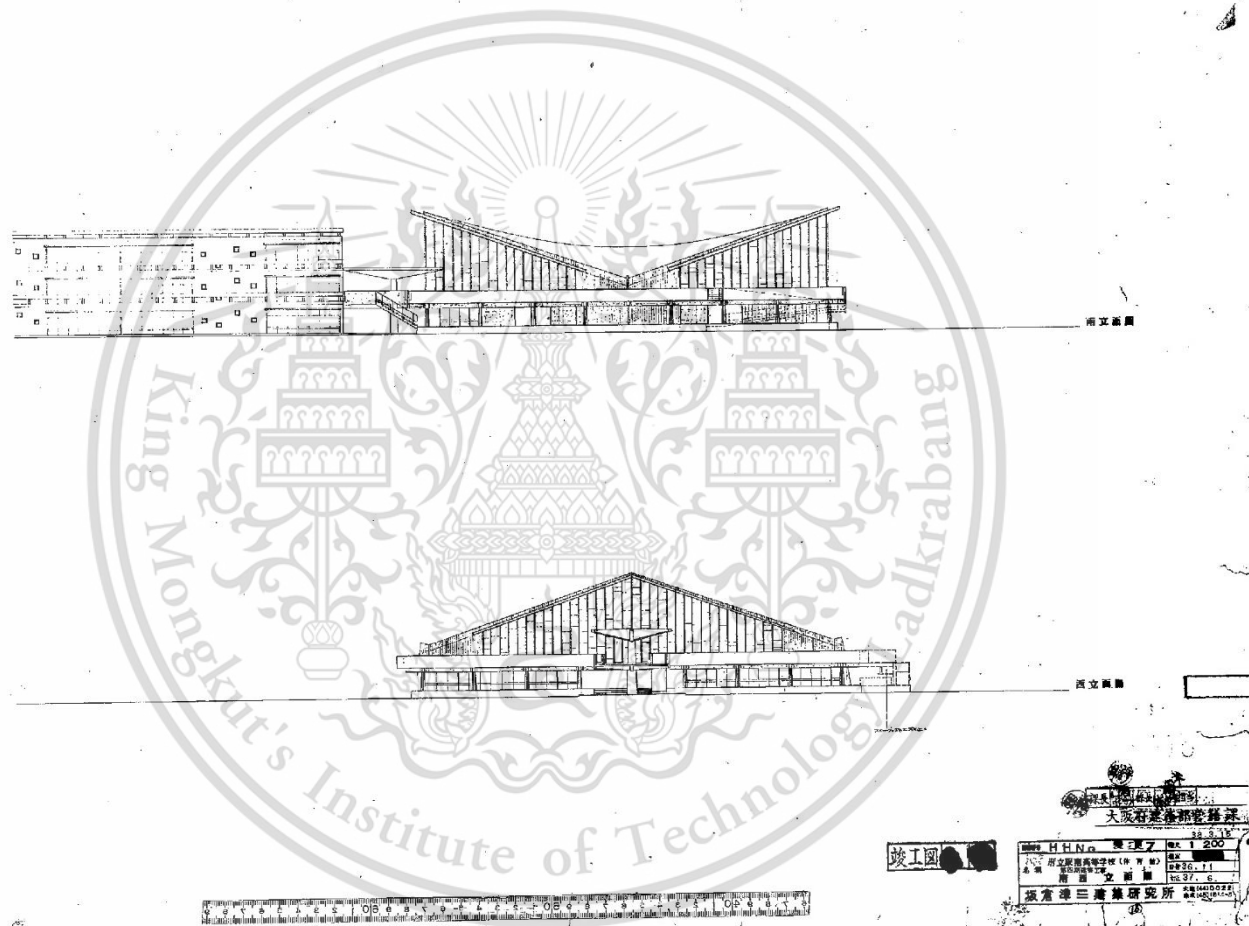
Elevation of gymnasium in Hannan High School (Source: Original drawing)
